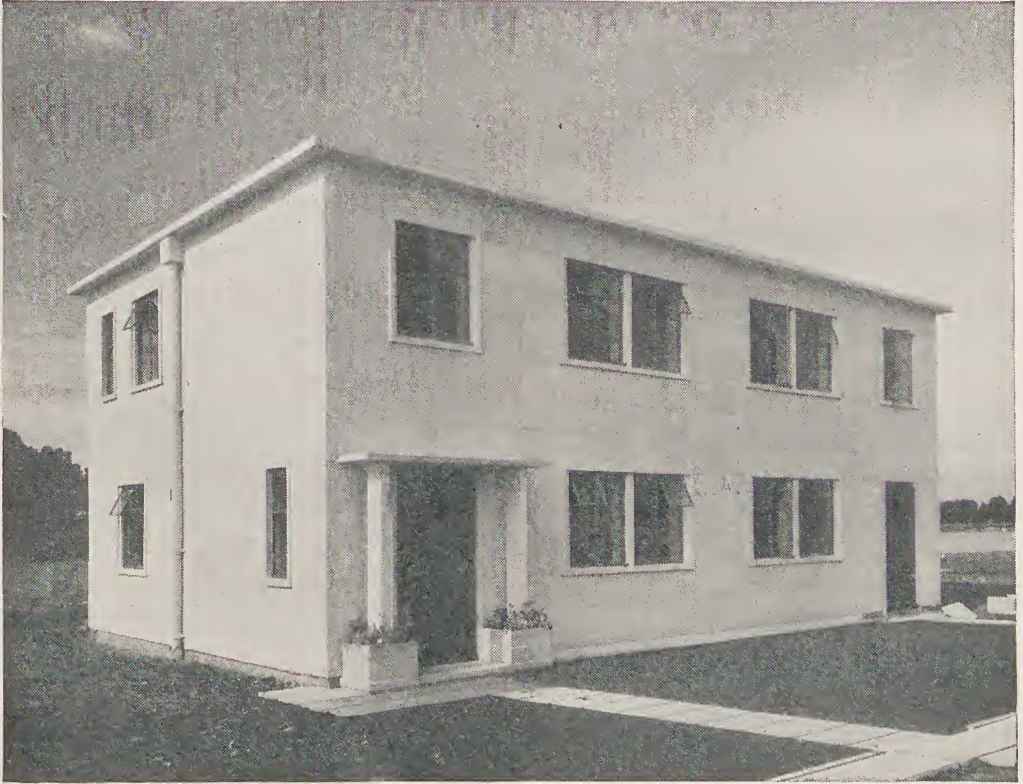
The "Orlitt" prefabricated house. Pre-cast concrete units.
